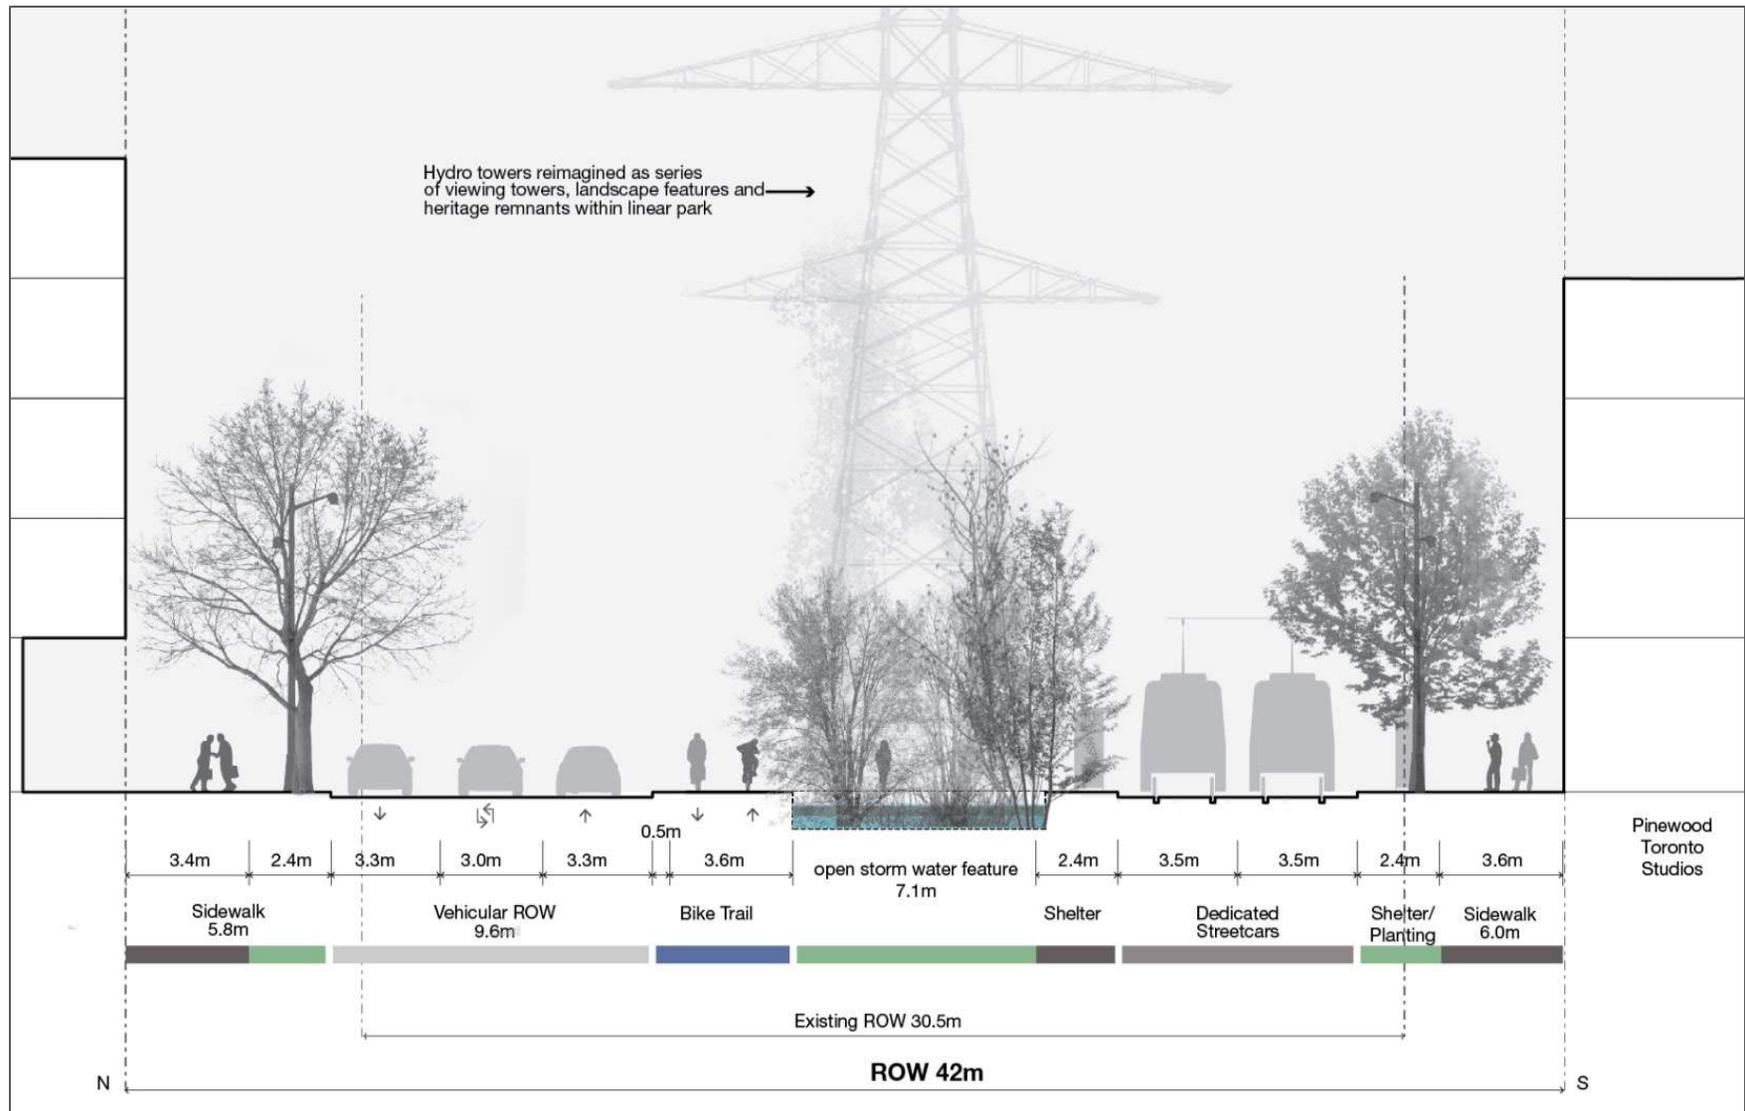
CONCEPTUAL CROSS-SECTION – COMMISSIONERS STREET, BROADVIEW AVENUE TO CARLAW AVENUE
